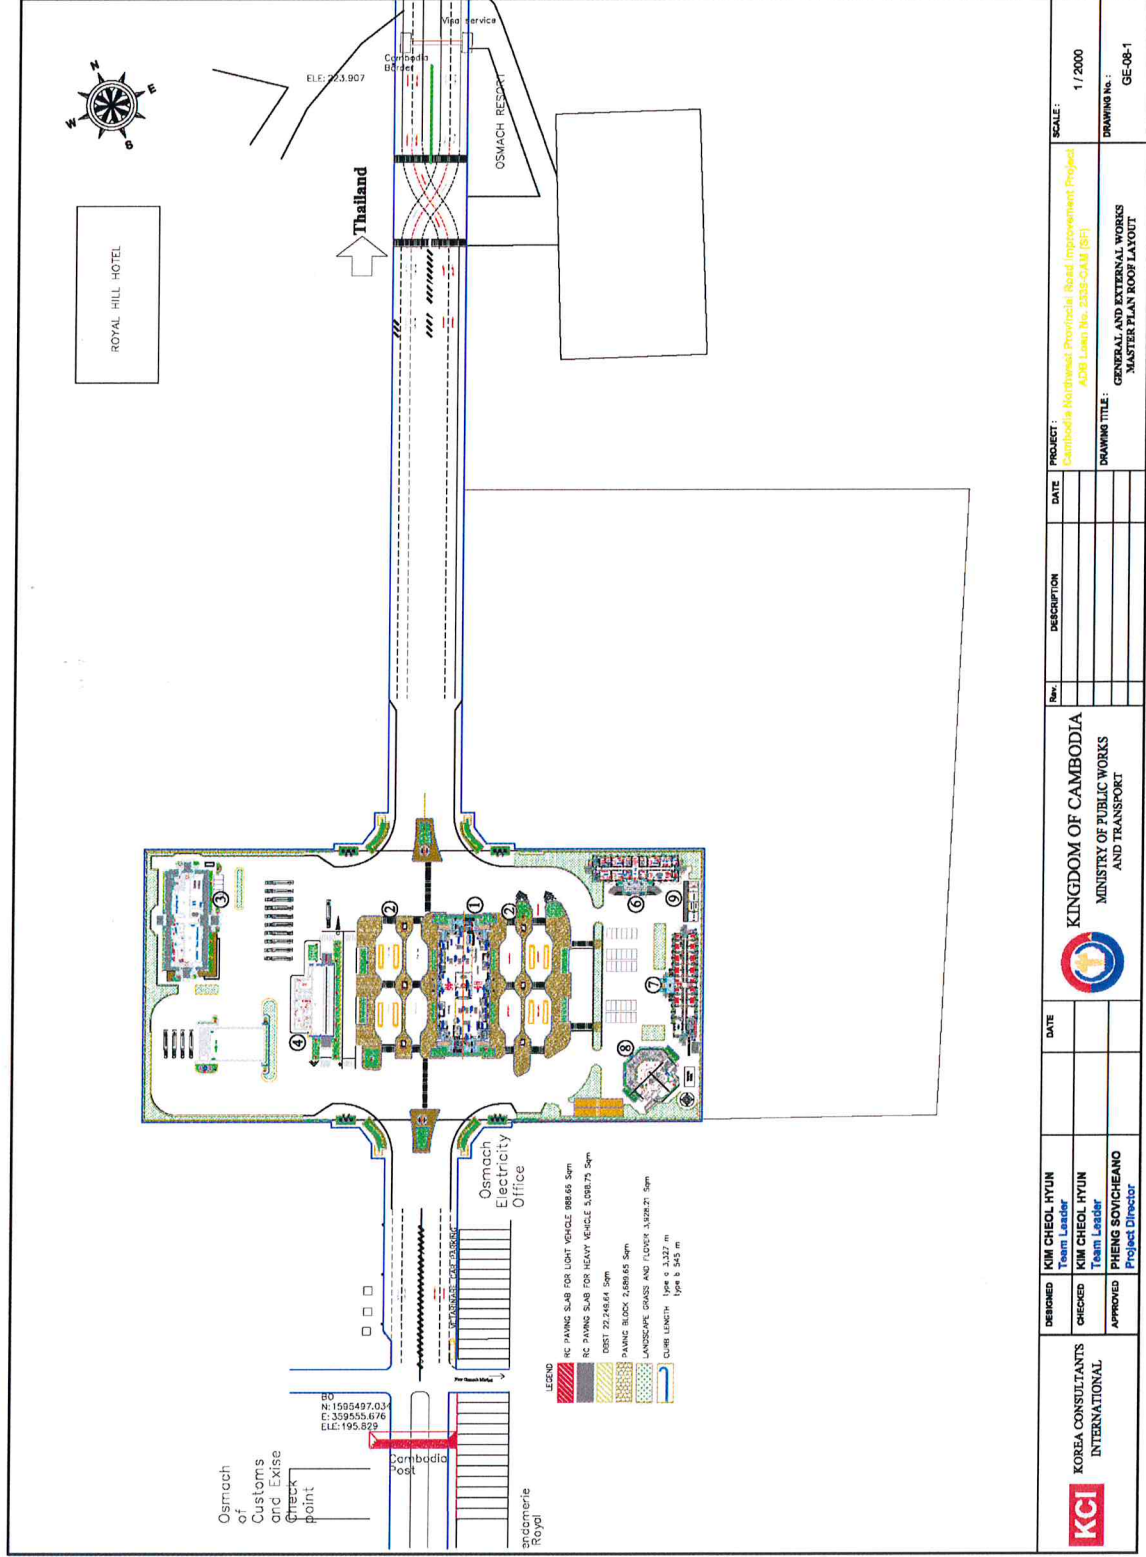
Draft rearranged layout plan of CBF at newly proposed location
